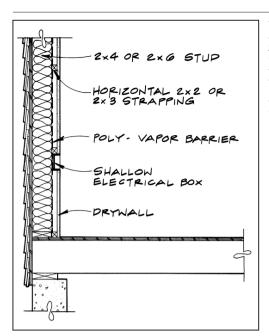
In a strapped wall, the poly air barrier is installed between the studs and horizontal strapping, leaving a 11/2-inch cavity for shallow electrical boxes.
